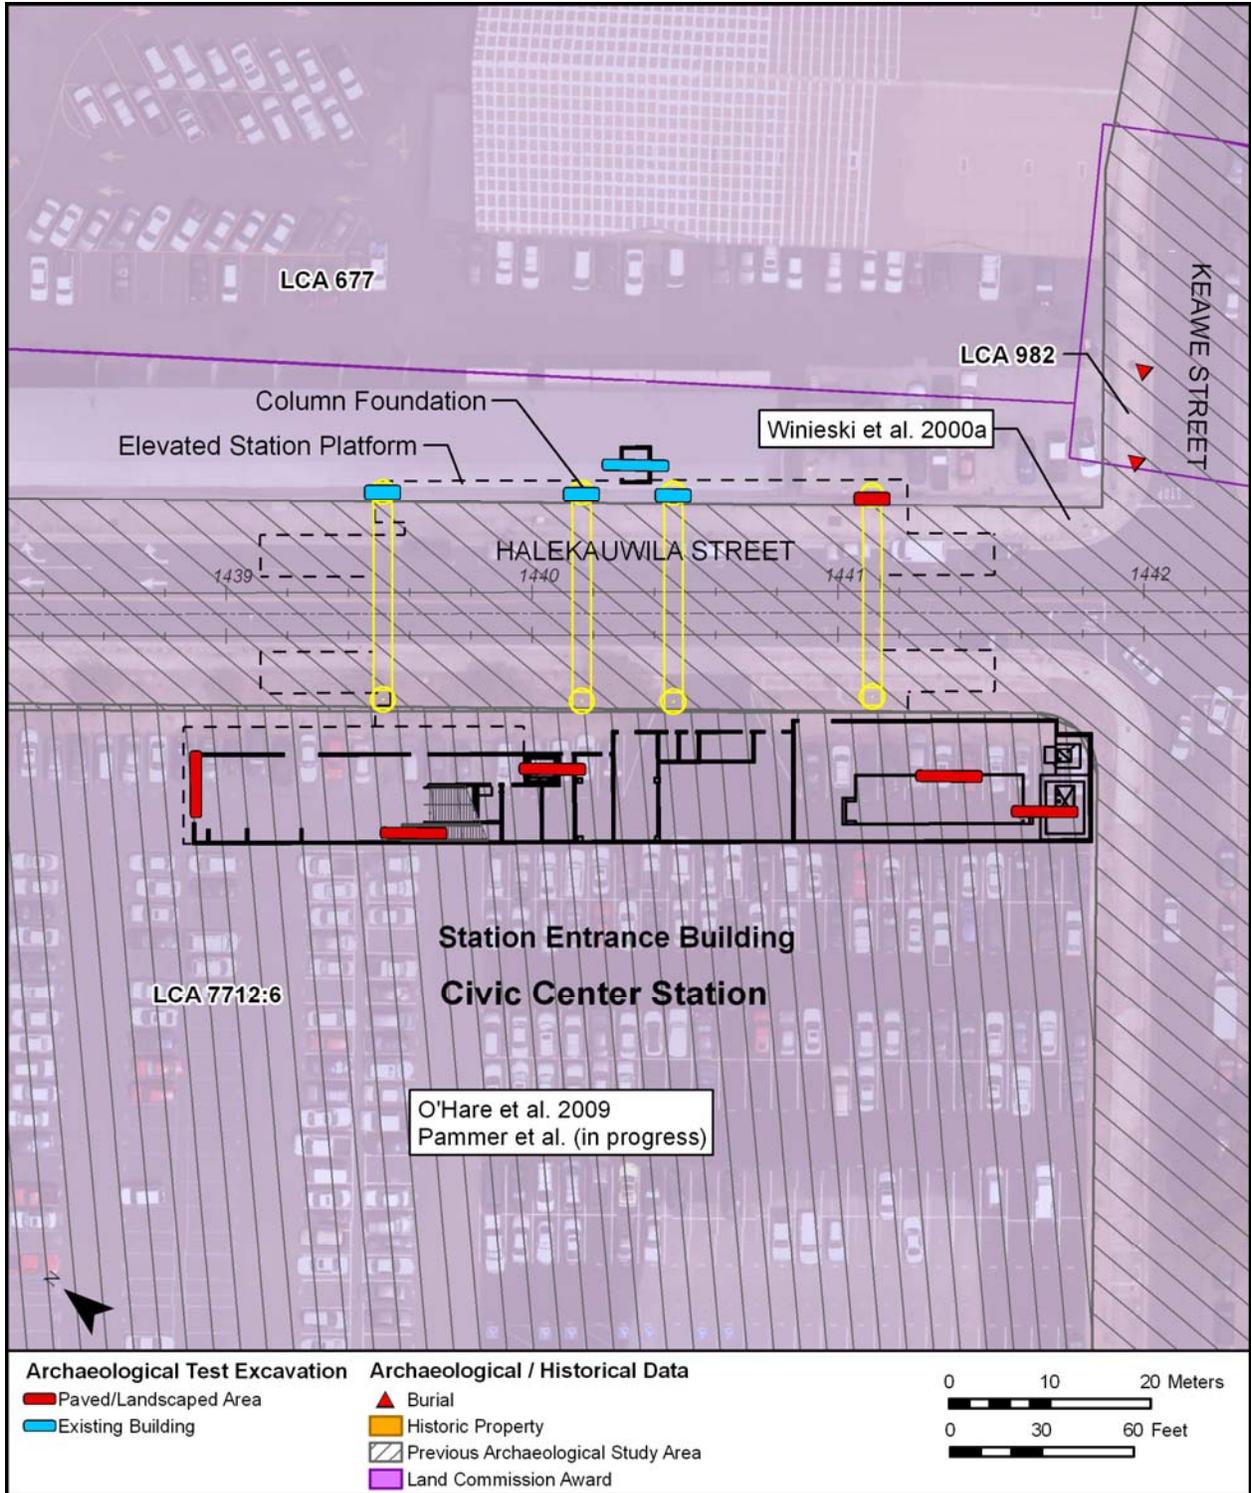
Civic Center Station (at Halekauwila Street just northwest of Keawe Street), aerial photograph showing overlay of transit station infrastructure (see following figures for details)
